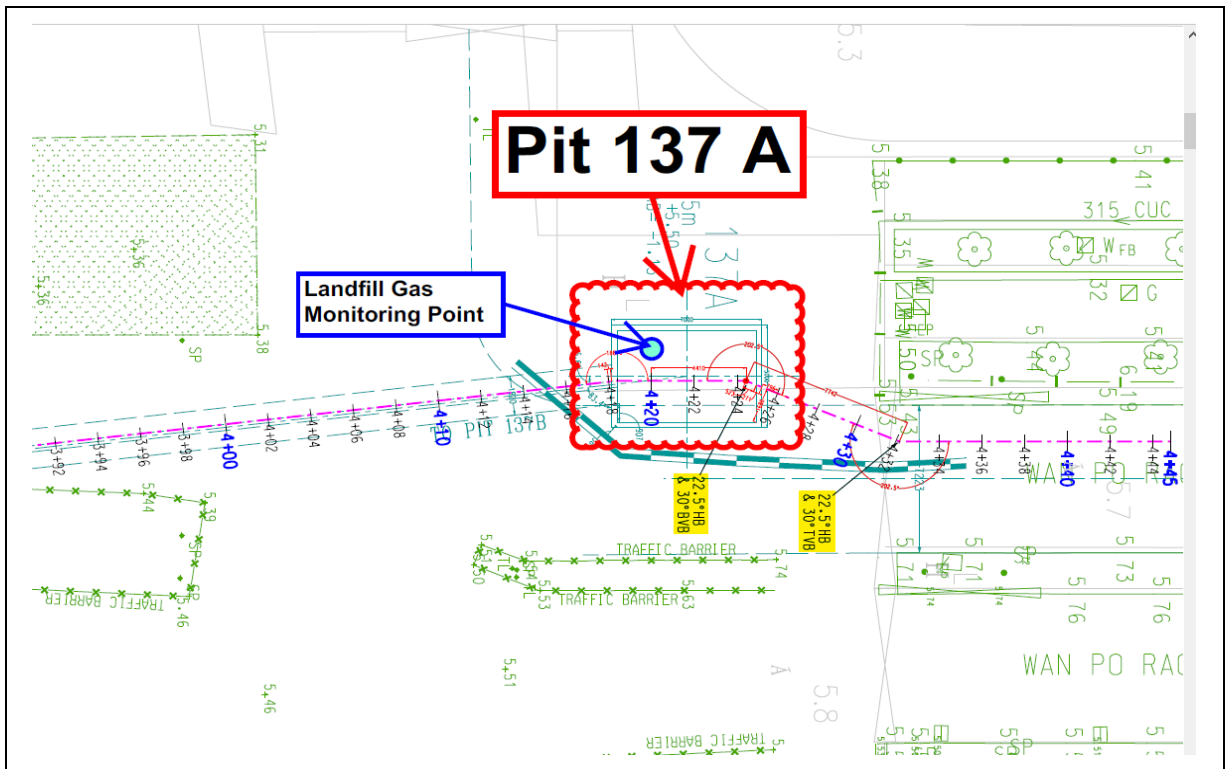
Monitoring Location – Pit 137A (137 Pit A)
